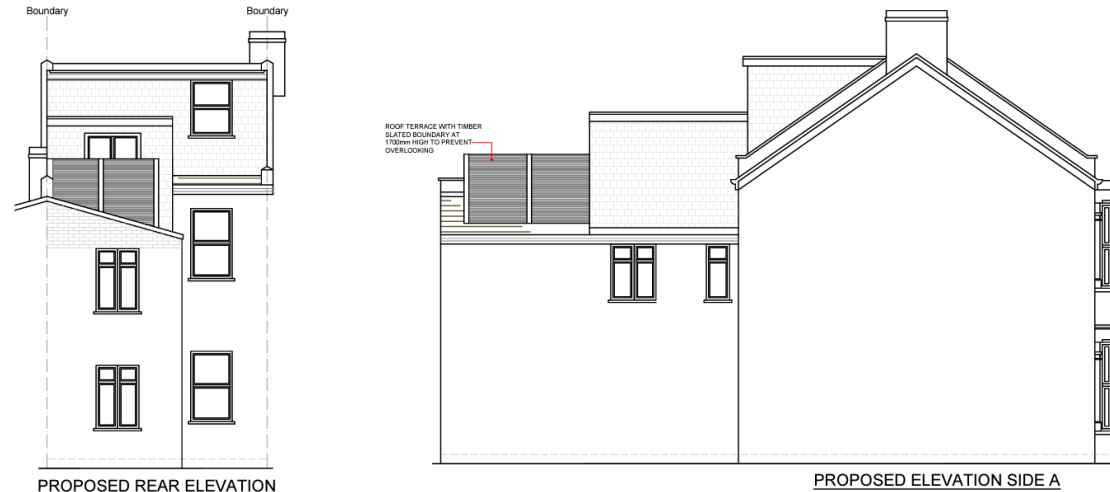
22B Colwell Road, illustrating roof terrace (drawing by Fast Plans)
